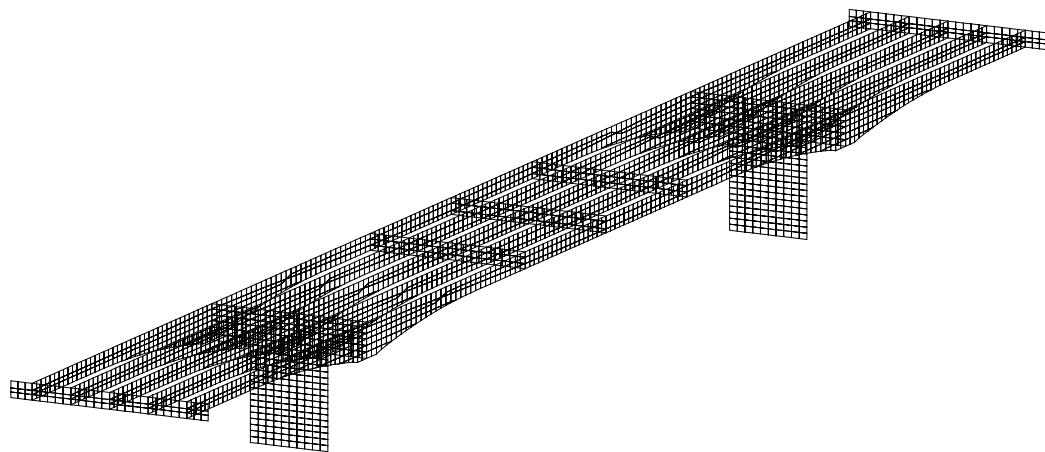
Bridge I873 Shown Without Bottom Sofit and Top Deck
